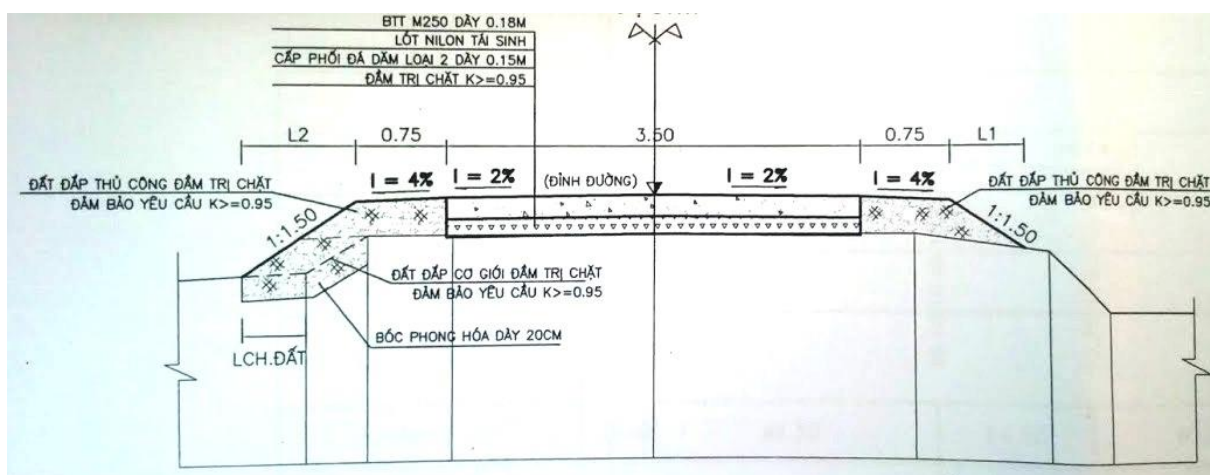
Cross section of road improvement in EM village in Tho Xuan district
